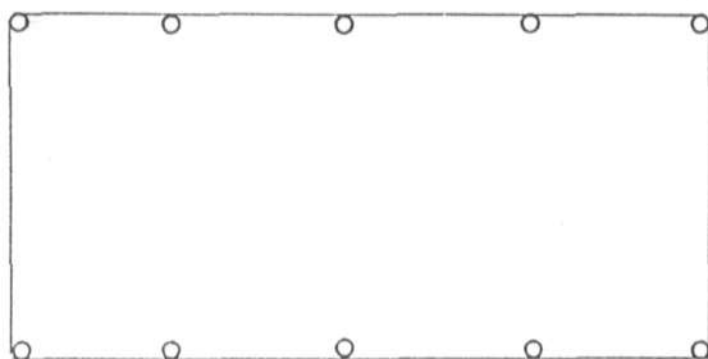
TYPICAL FLOOR PLAN OF 'AJE' (MARKET SHED)
